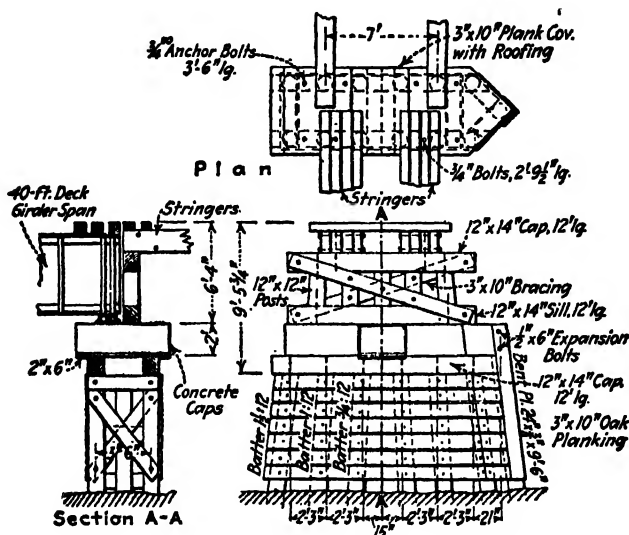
a*.—Timber Pile Pier for Bridge over Platte River.
